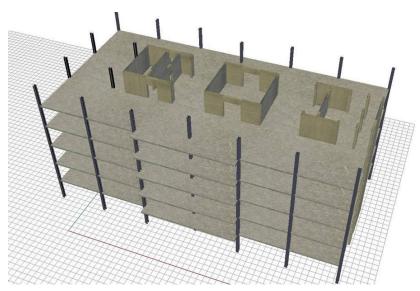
Perspective view of the structural elements (staircase and floor openings omitted), @ Arup
